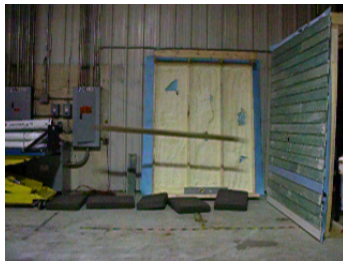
No penetration of Wall 2 and penetration of Wall 4 at 43 fps
